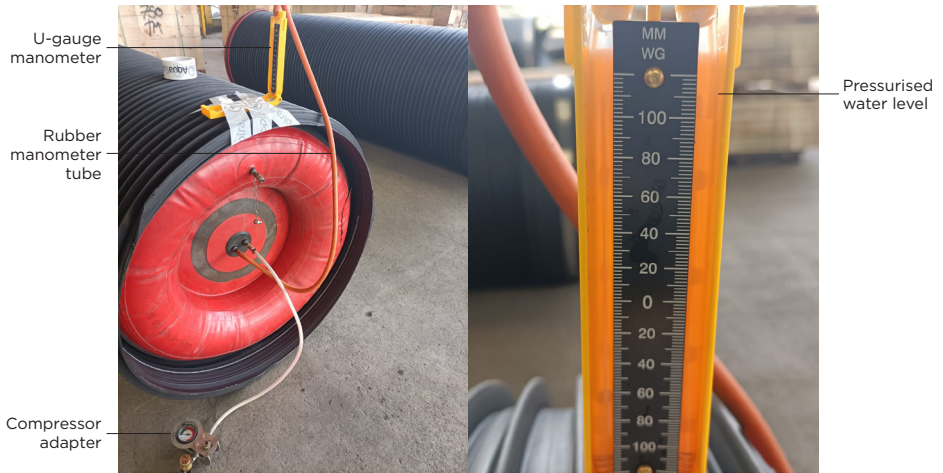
Picture of air testing set up showing pressurised pipe complete with inflated test stopper, U-gauge manometer, and air supply (left) and close up picture of U-gauge manometer showing 100mm water pressure (right)
